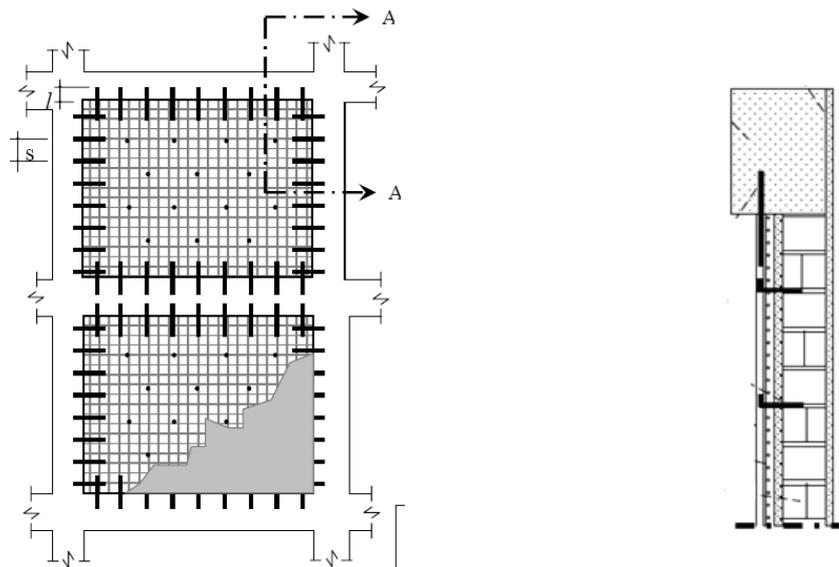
Plastered wall with welded external mesh and plaster composite (TEC-2007)
